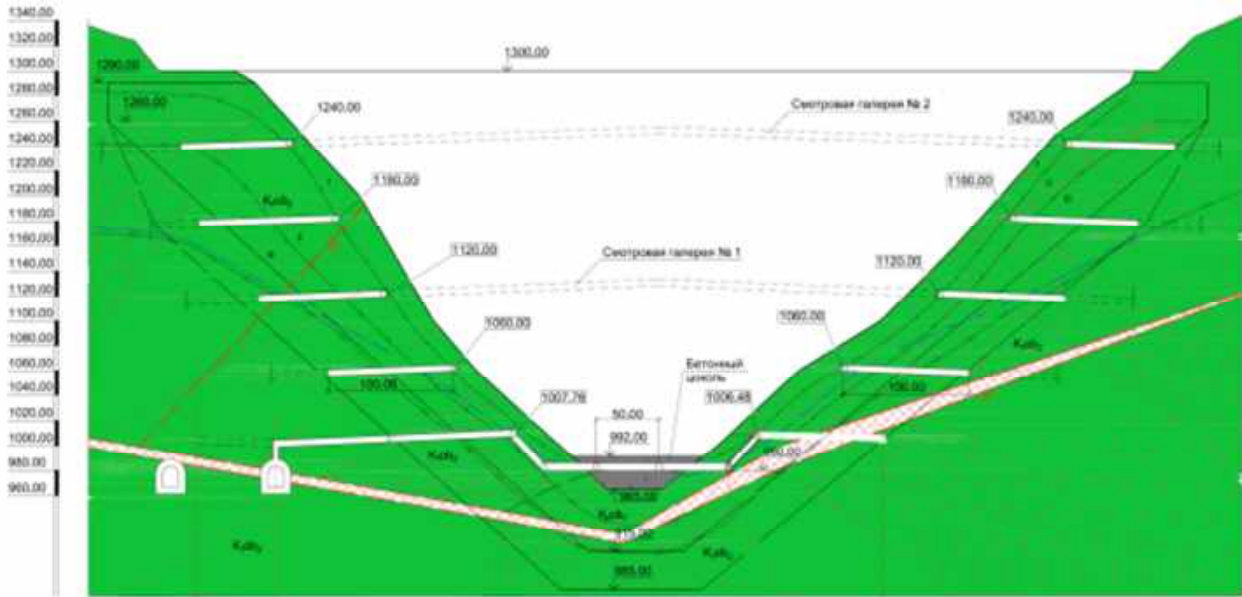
Illustrative typical cross section of the dam site according to HPI 2010 design
